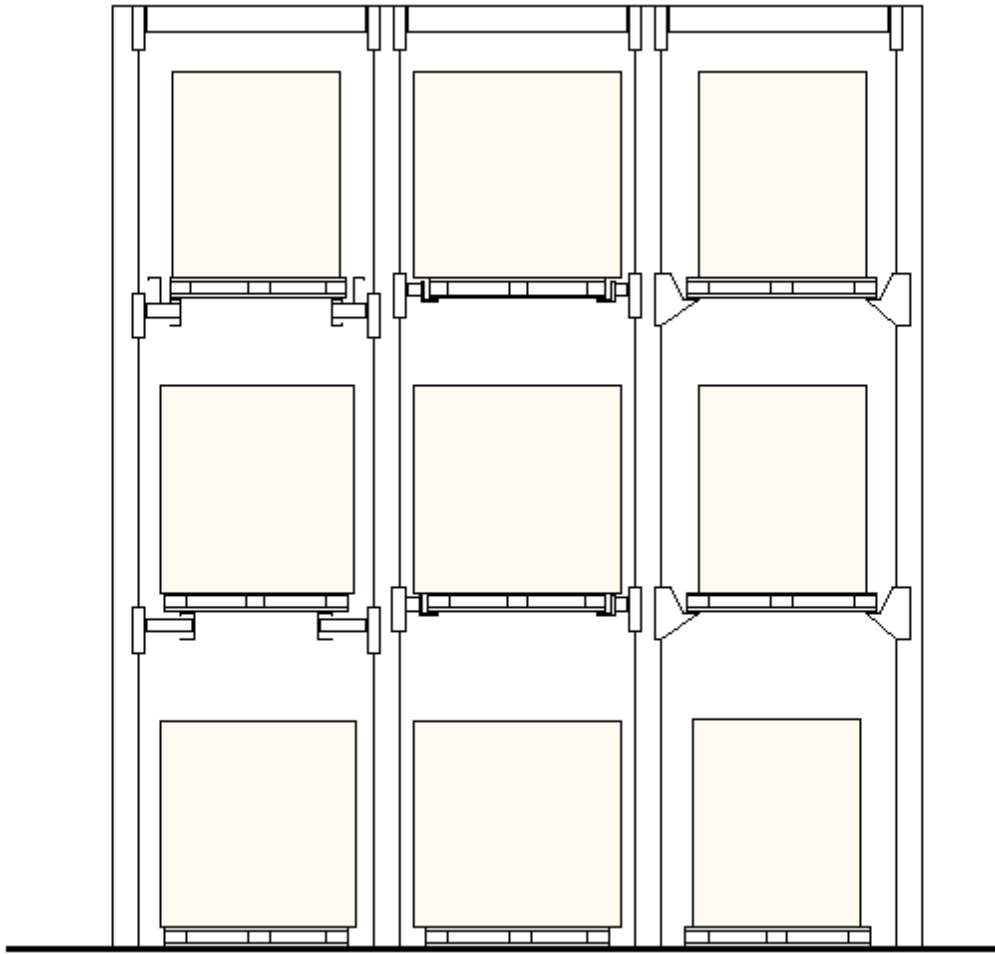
Typical configuration of an unbraced Drive-Through Rack structure (various types of side arms and pallet rails are shown)
